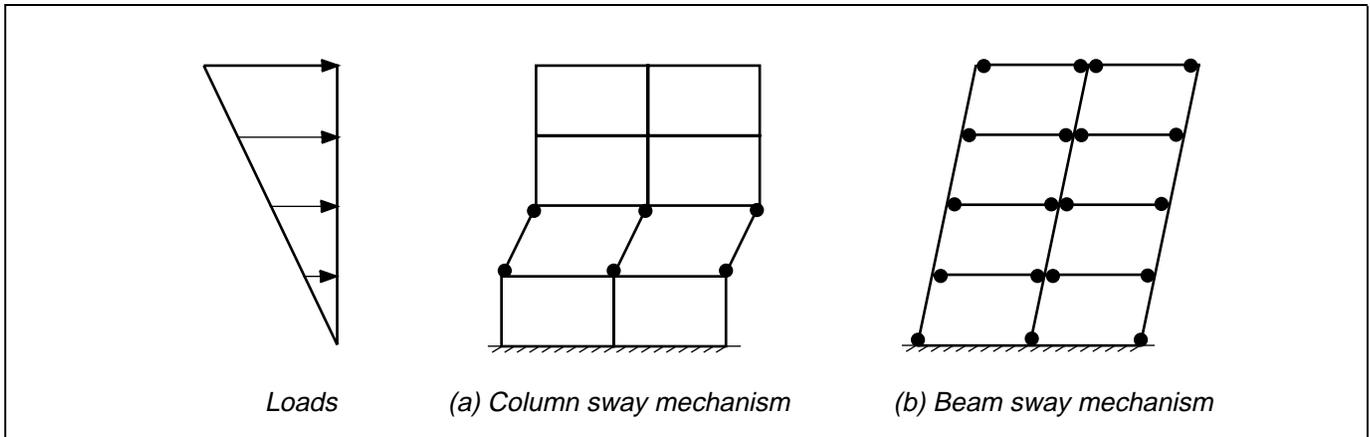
Flexural Failure Mechanisms of Reinforced Concrete Frames
